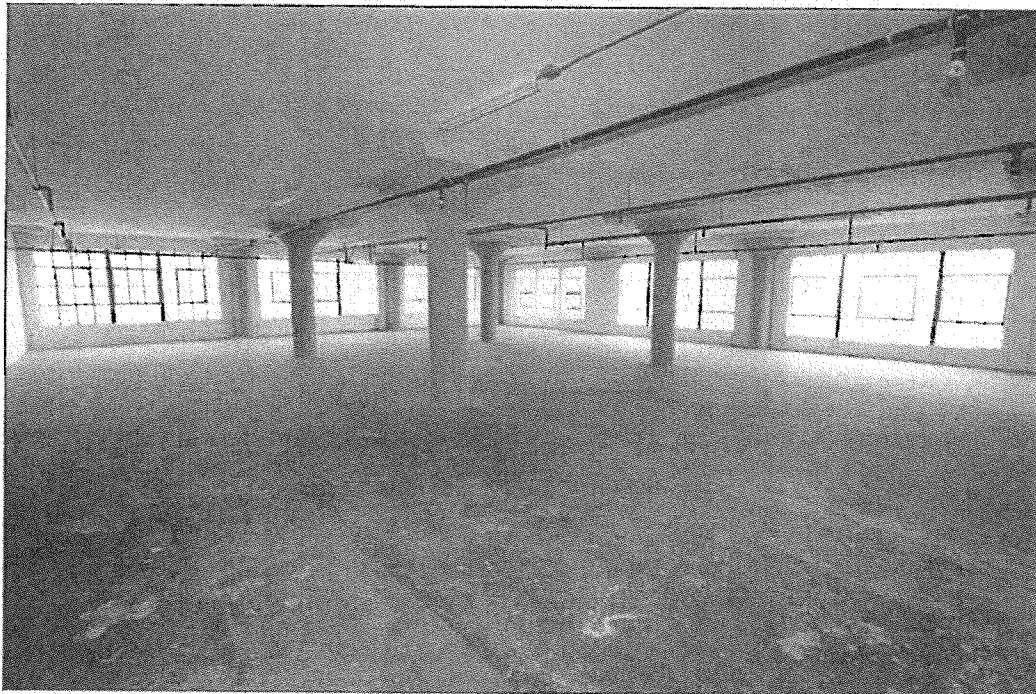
Maxfield Building, 819 S. Santee Street, interior view north of third floor corridor (Chattel, Inc., December 4, 2012)
